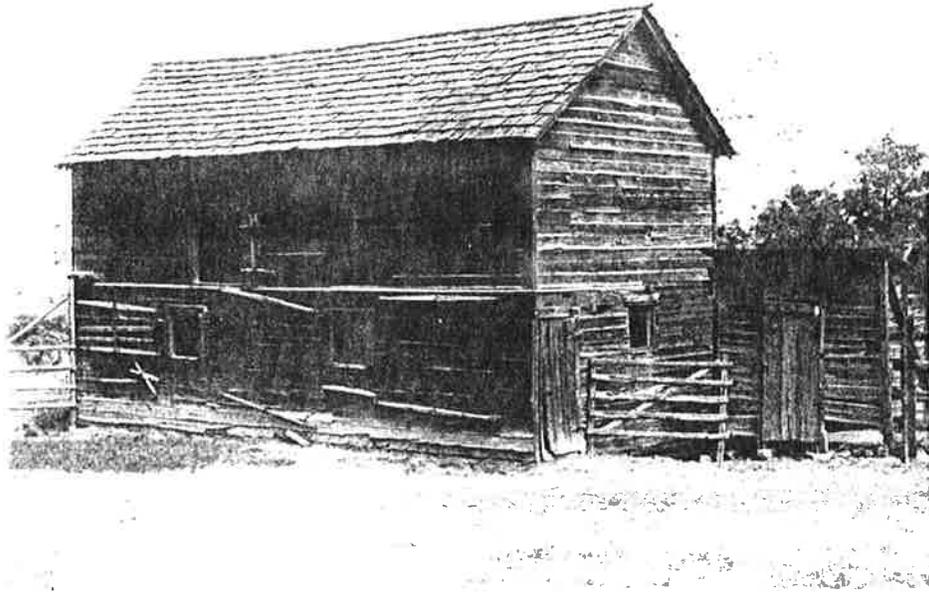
Birch Creek barn, west and south (gable) elevations, facing into corral. Tack room building is to the right. (Neg. R2-32)
